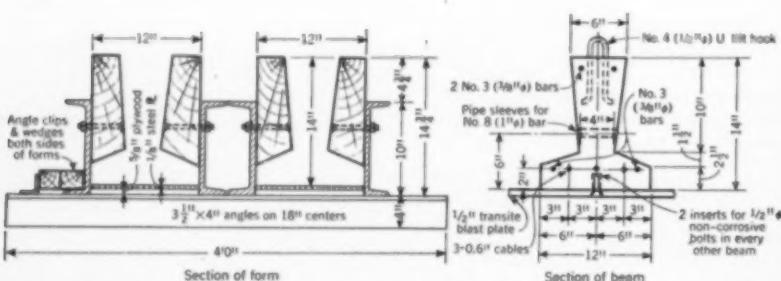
Skew crossing and limited clearance indicated use of precast beams in combination with cast-in-place concrete floor slab.
